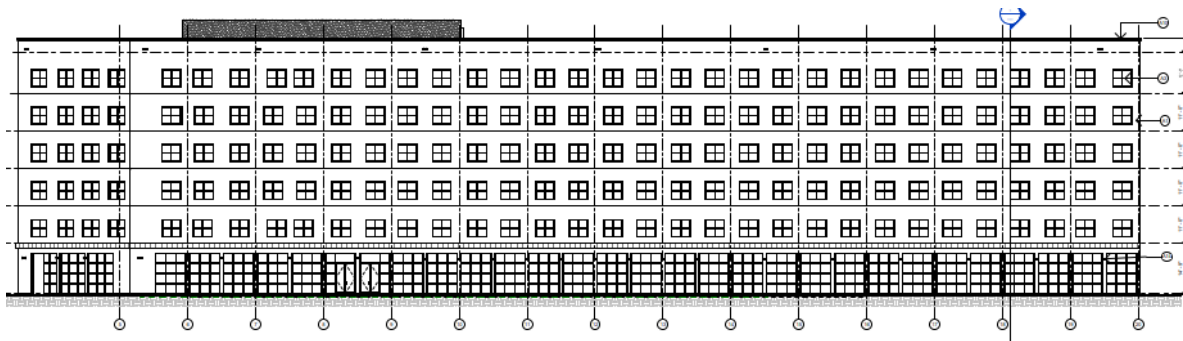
South Elevation Based on the New Drawings Received on April 16, 2025
